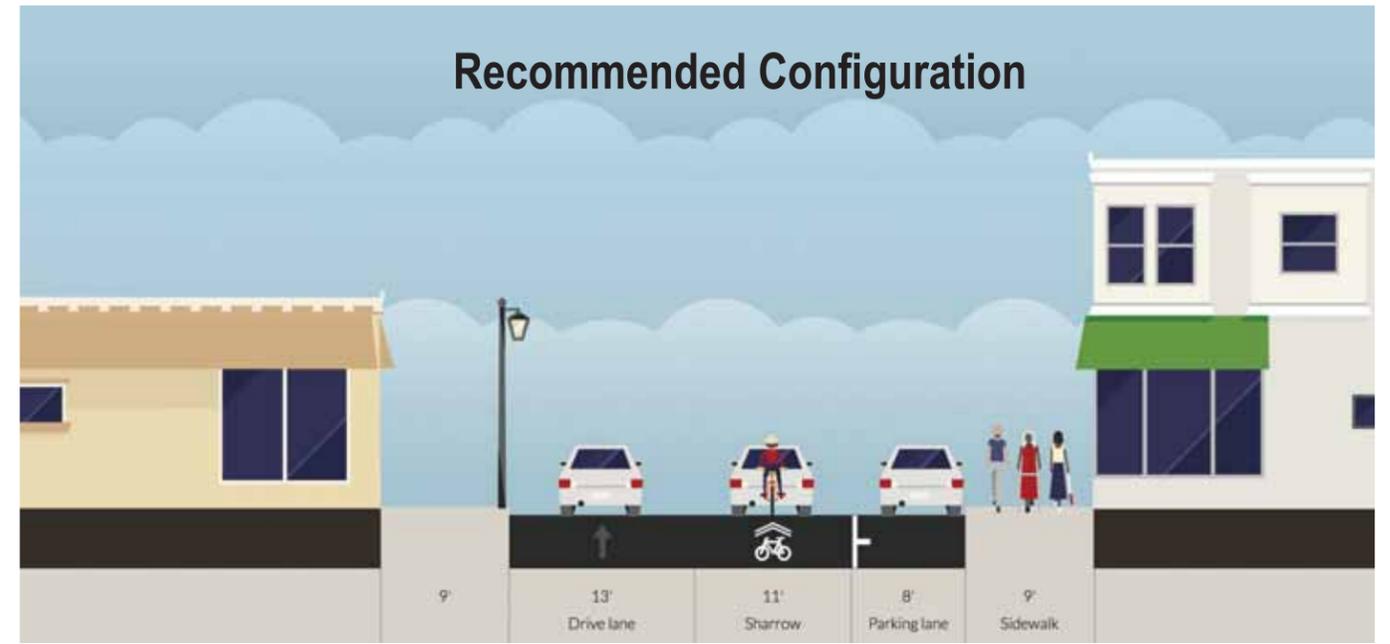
Short -Term Recommendations. One-way Elm Street Near Lancaster Street - North
